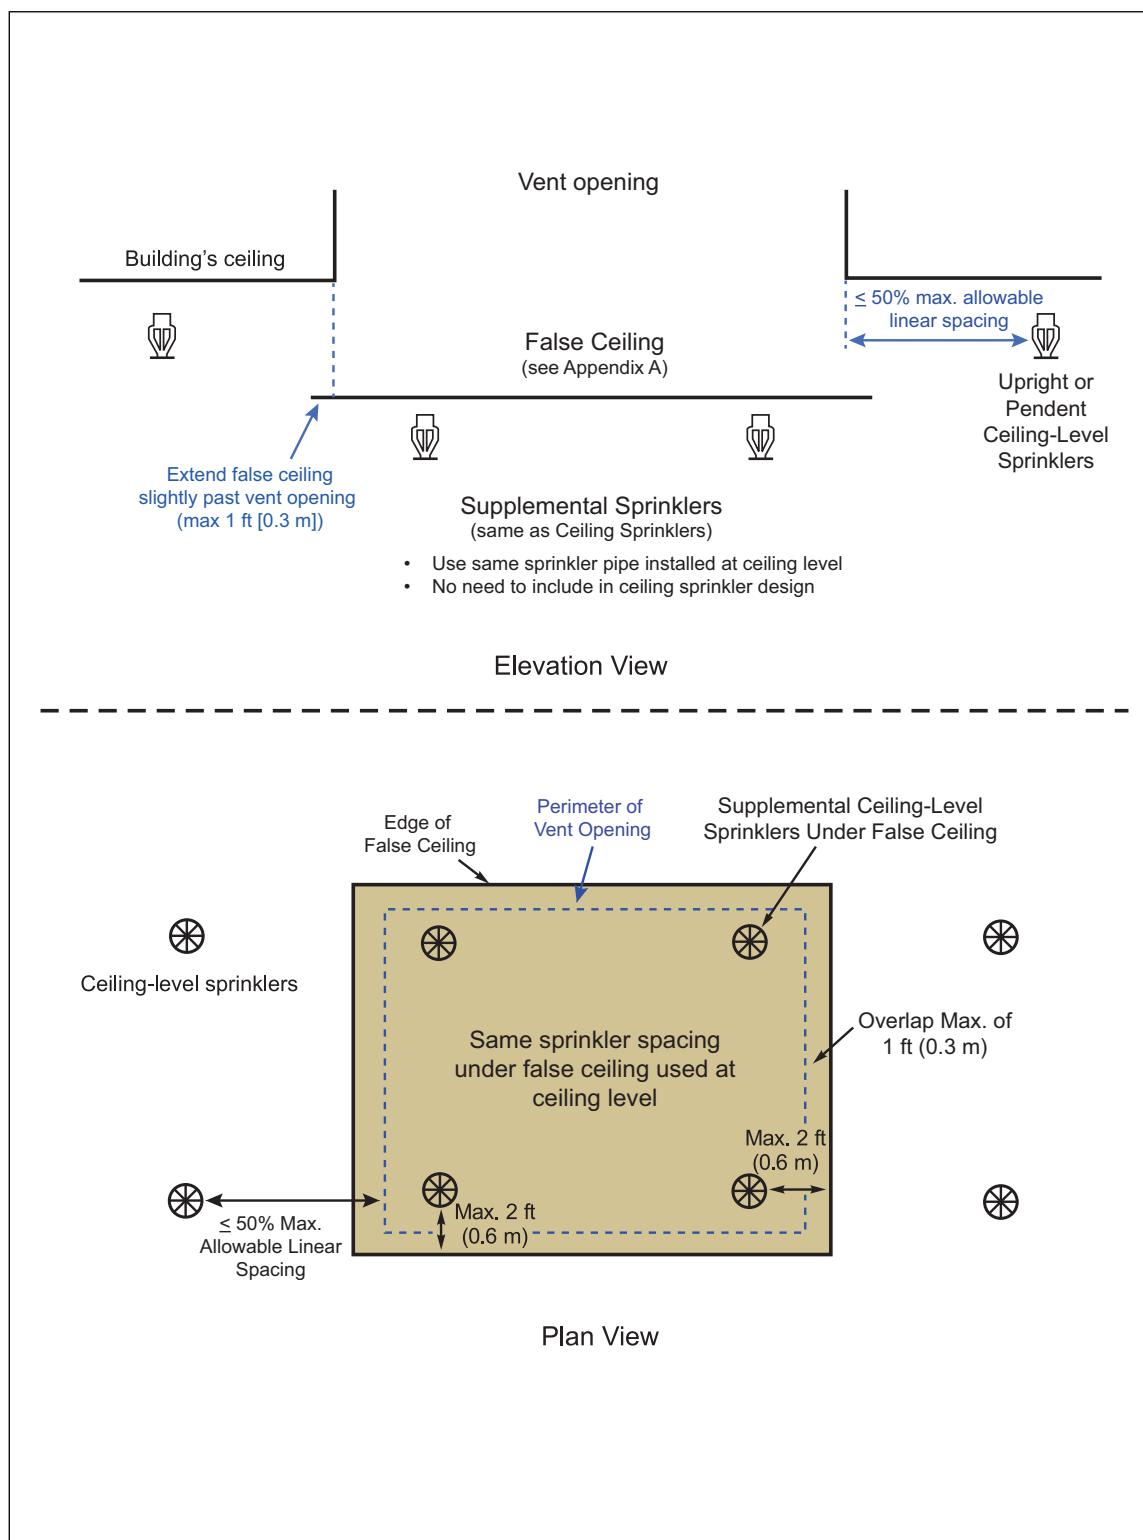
(b). Protection of vent openings at ceiling level, such as heat vents, smoke vents, powered or natural draft exhaust vents, with a flat, continuous false ceiling and supplemental ceiling-level sprinklers
